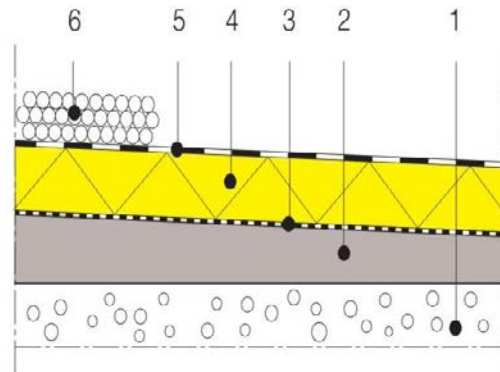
Warm roof: (a) Diagram of a warm roof [29],
